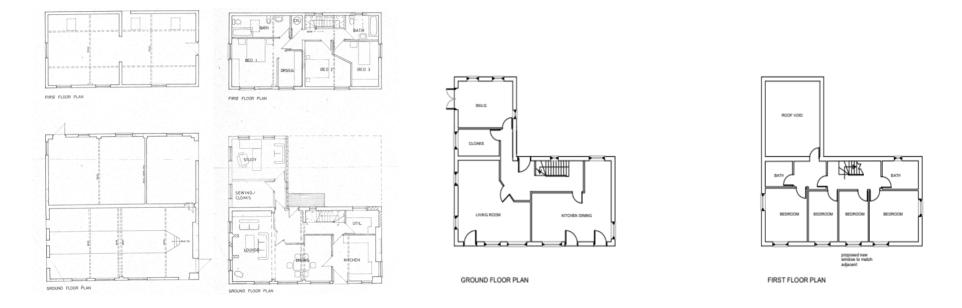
Left: Existing and floor plans 1993. Right: Proposed plans.
